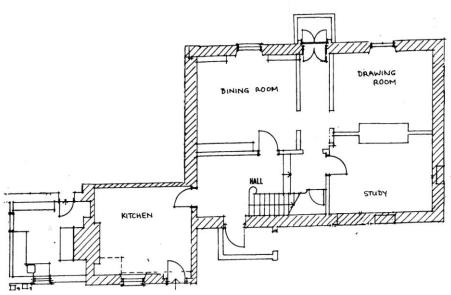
Conjectural arrangement of rooms on ground floor of original house (Plan from Lee and Ross, Architects Oxford, 1997 with permission)
